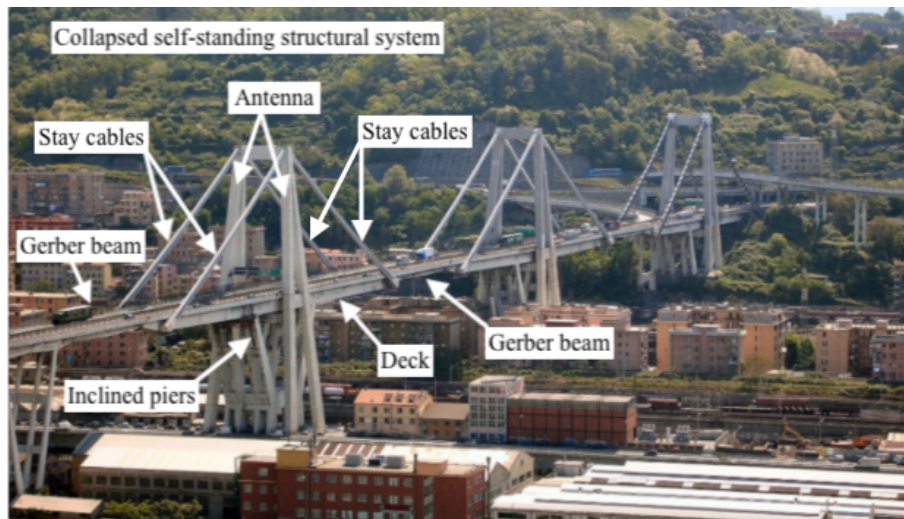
Three self-standing structural systems of Polcevera Bridge, with details of the structural elements of the collapsed part.
